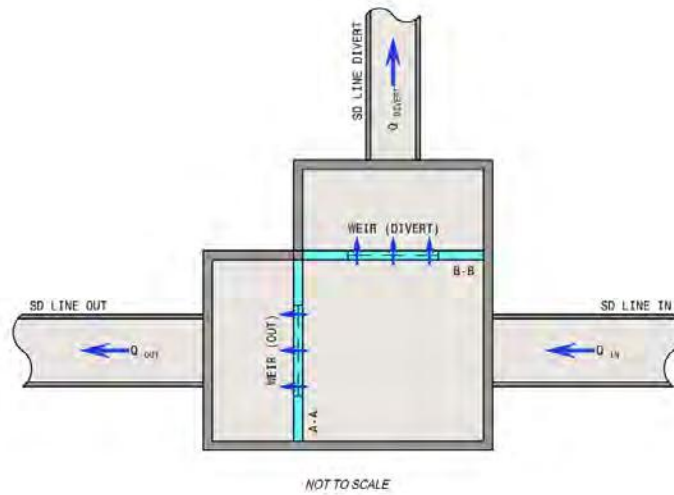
Stormdrain Diversion Structure Concept: Plan View for WDS # 2 and # 3
